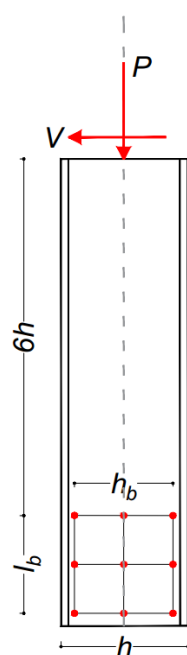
Column-to-base bolted connection subjected to compression, bending and shear
